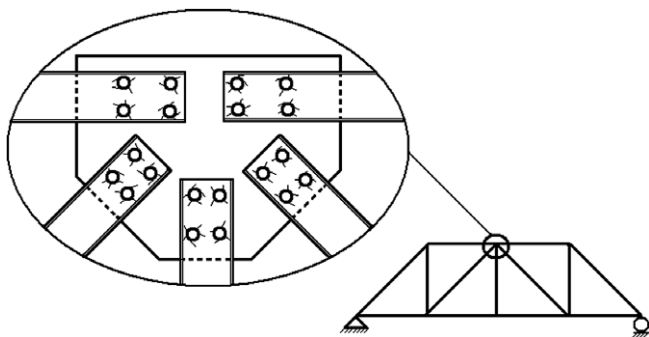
A schematic picture of fatigue damage in a truss joint.
